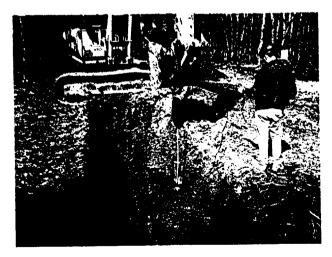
Scanning Base of Excavation 1 (View Facing West)
